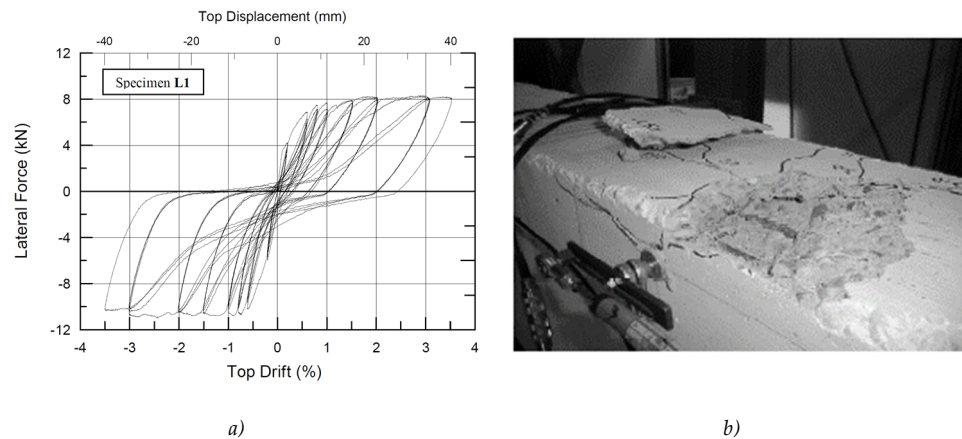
L-joint specimen: capacity curve a) and top beam side concrete damage b) (Pampanin et al., 2002).
